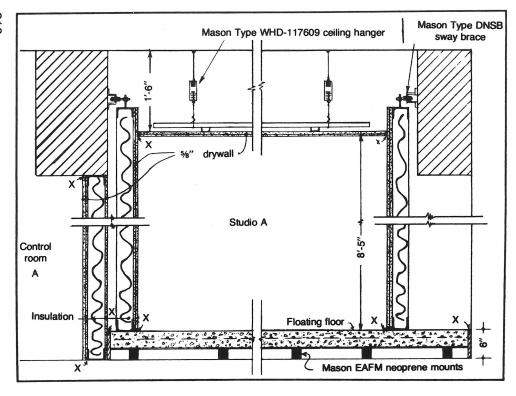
Section A-A of Fig. 11-1 of PBA Studio A walls and floor. The floating floor of reinforced concrete supports the four walls. The ceiling is resiliently supported from the building structure.
